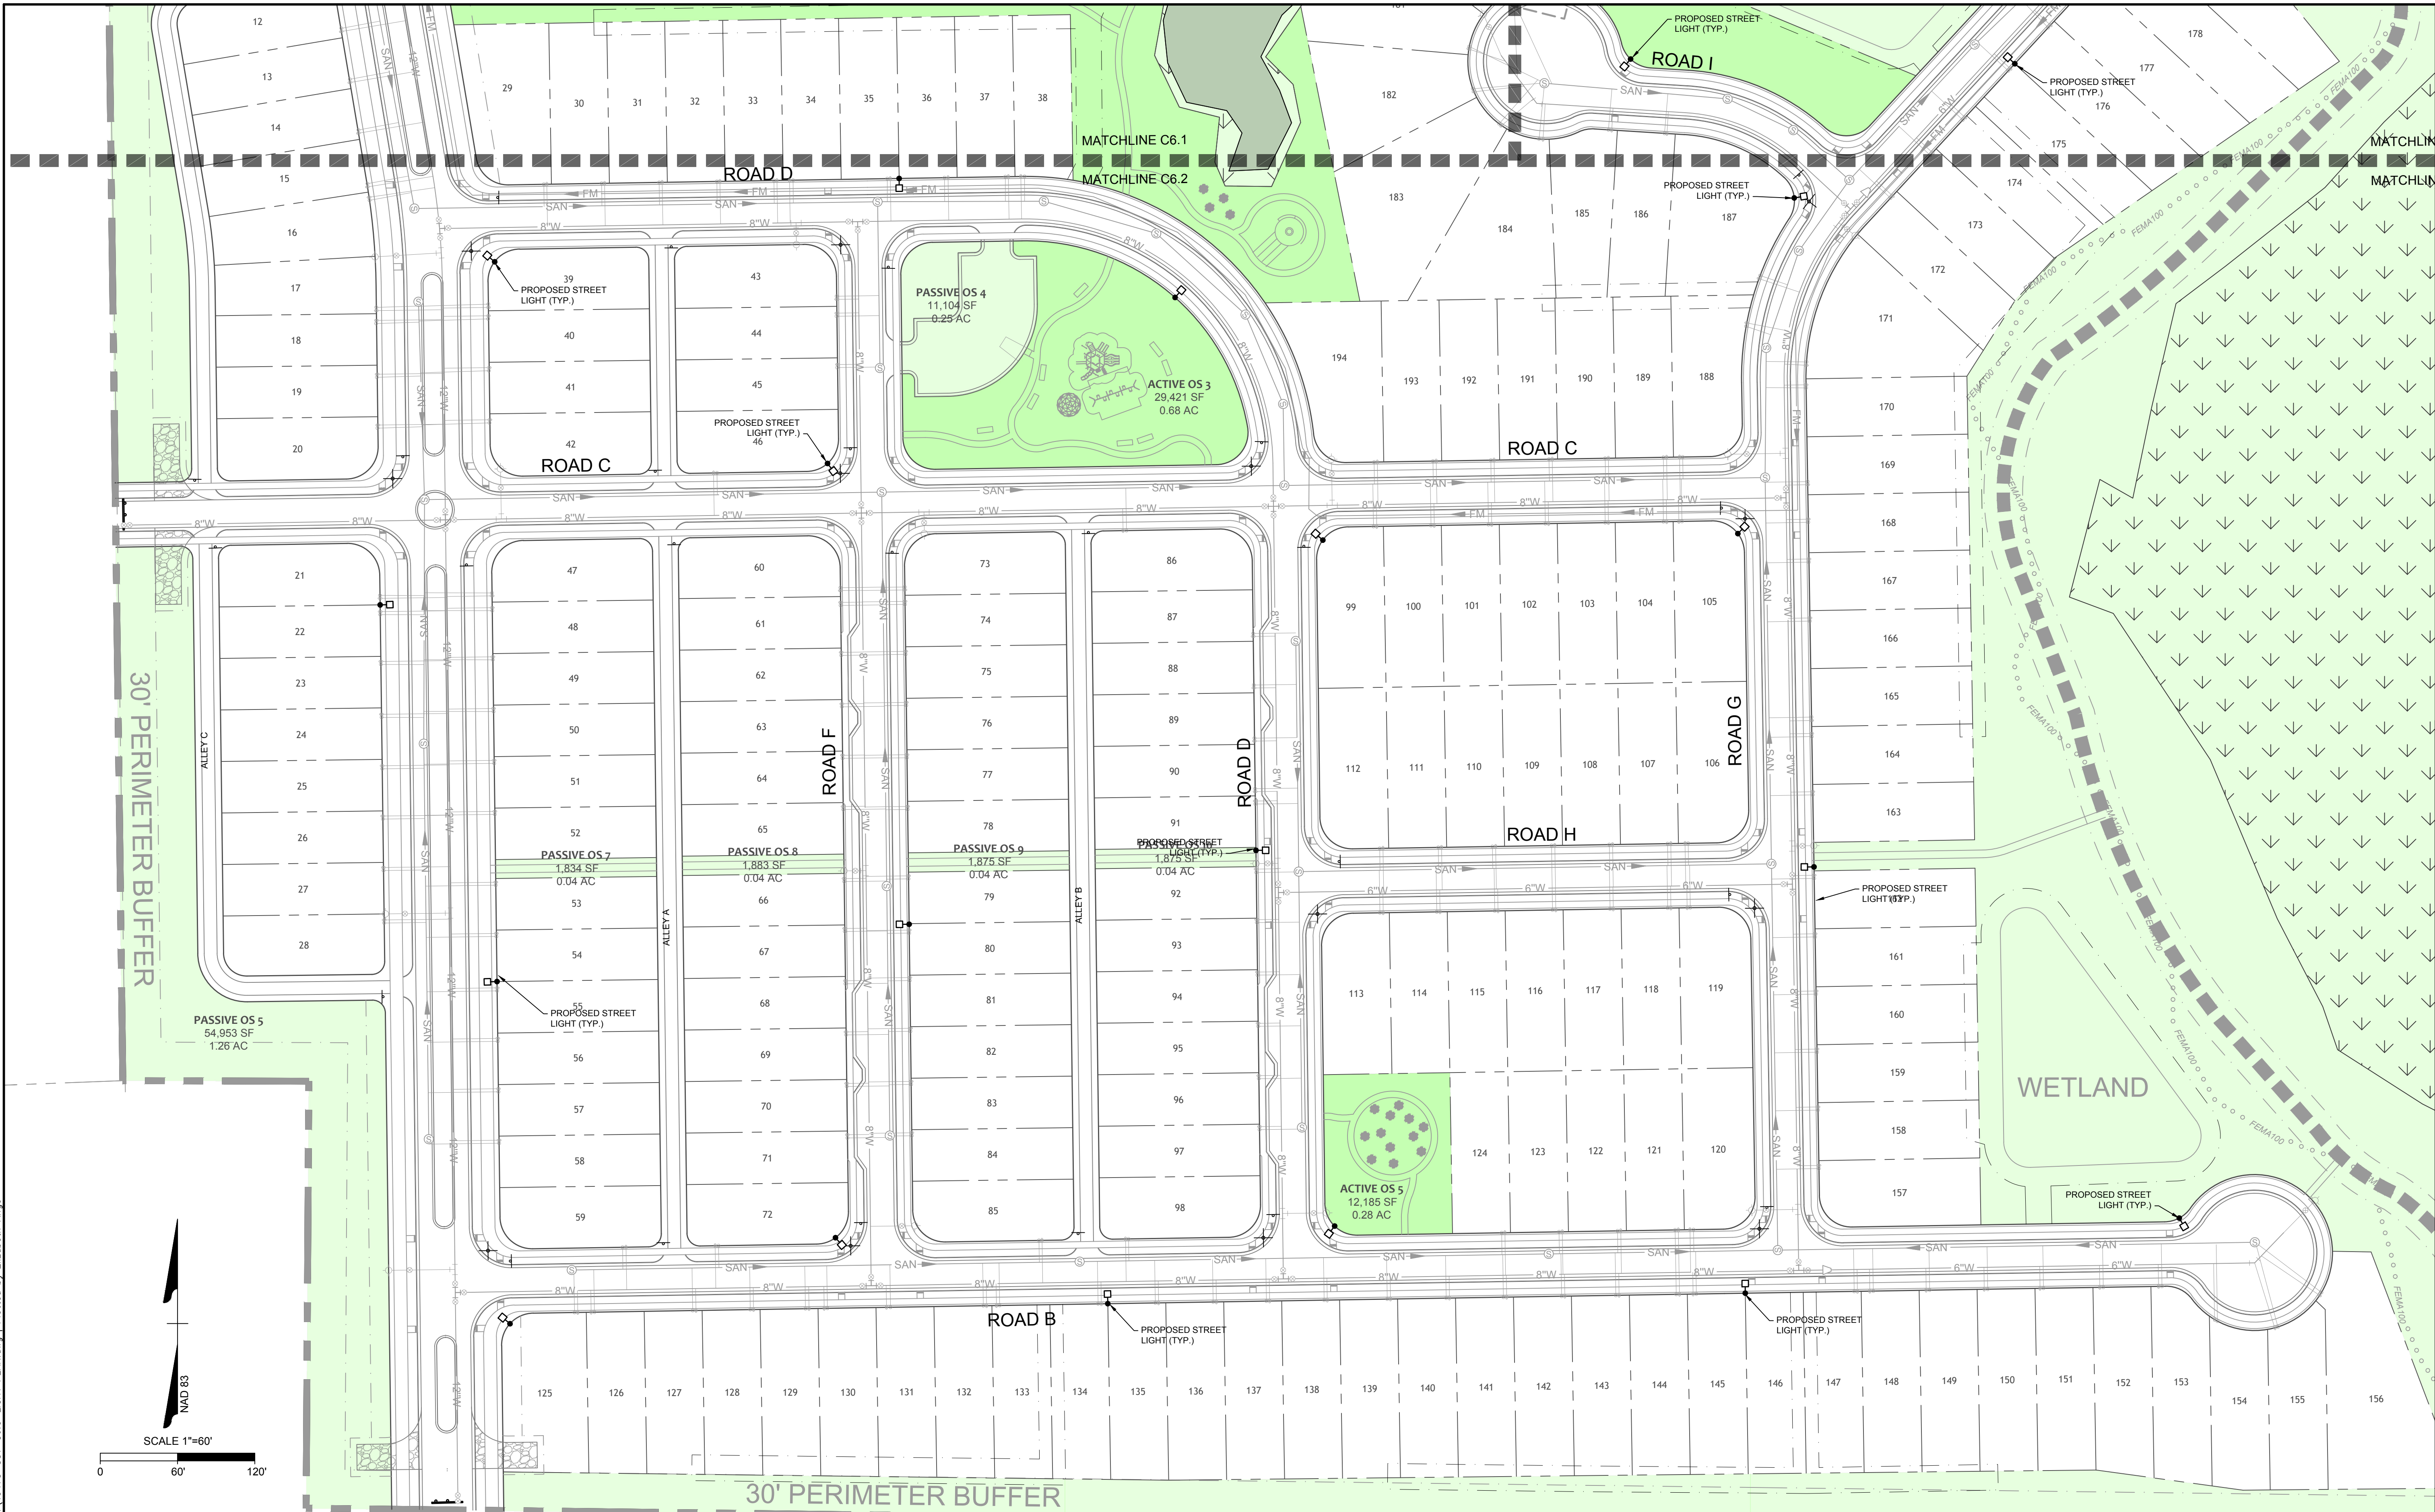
DETAILED LIGHTING PLAN SHEET 1 OF 3
